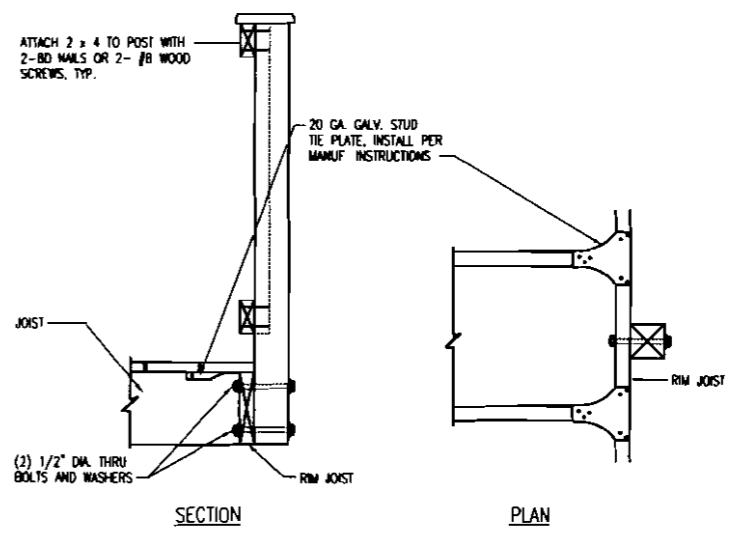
GUARD POST TO RIM JOIST DETAIL - OPTION 2
